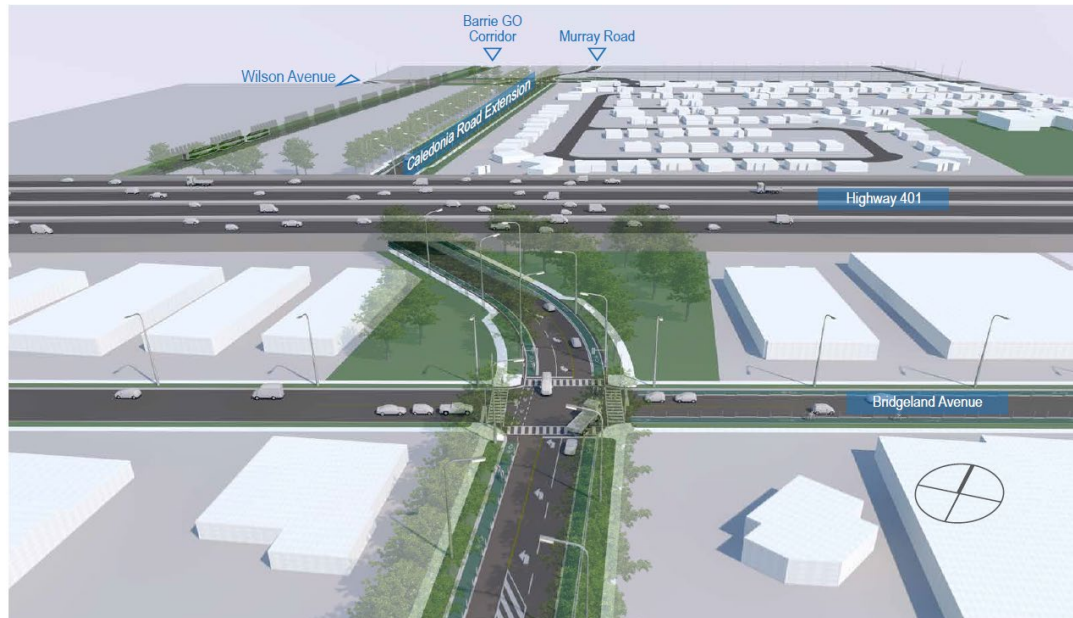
Conceptual Caledonia Road Extension Looking North from Bridgeland Avenue
